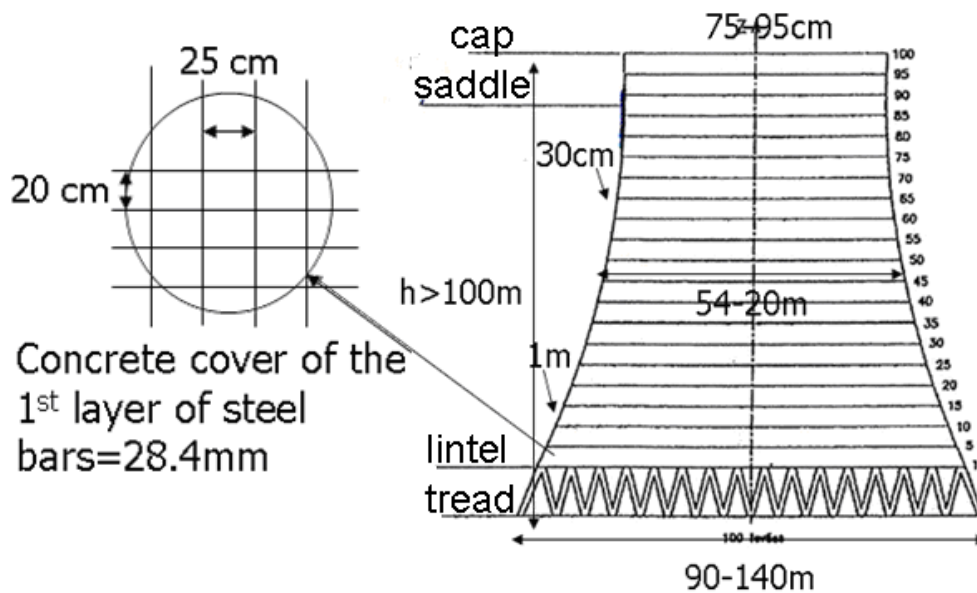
2: Schematic illustration of cooling towers (F. Coppel, 2009).. Moving from the top and downwards: cap, saddle, lintel and tread. The shell consists of a compact double layer reinforcement network embedded in concrete. The average concrete cover of steel rebar, whether extrados or intrados is around 3cm (Eiffage, 2009).
